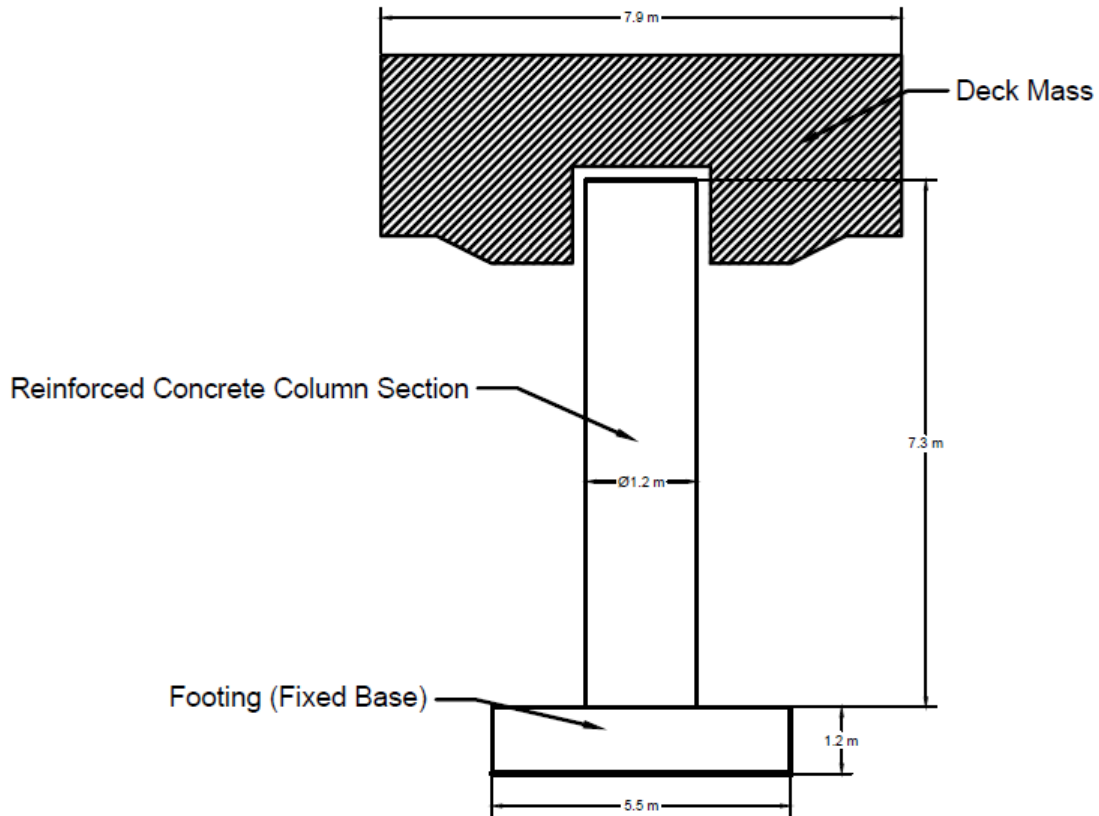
Full-Scale Bridge Column Test Setup (after, Schoettler et al., 2015)
